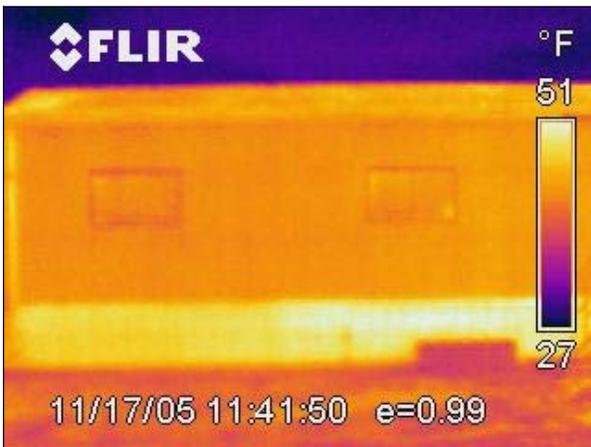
(IR0033) Northwest corner of Gas Plant Office.
